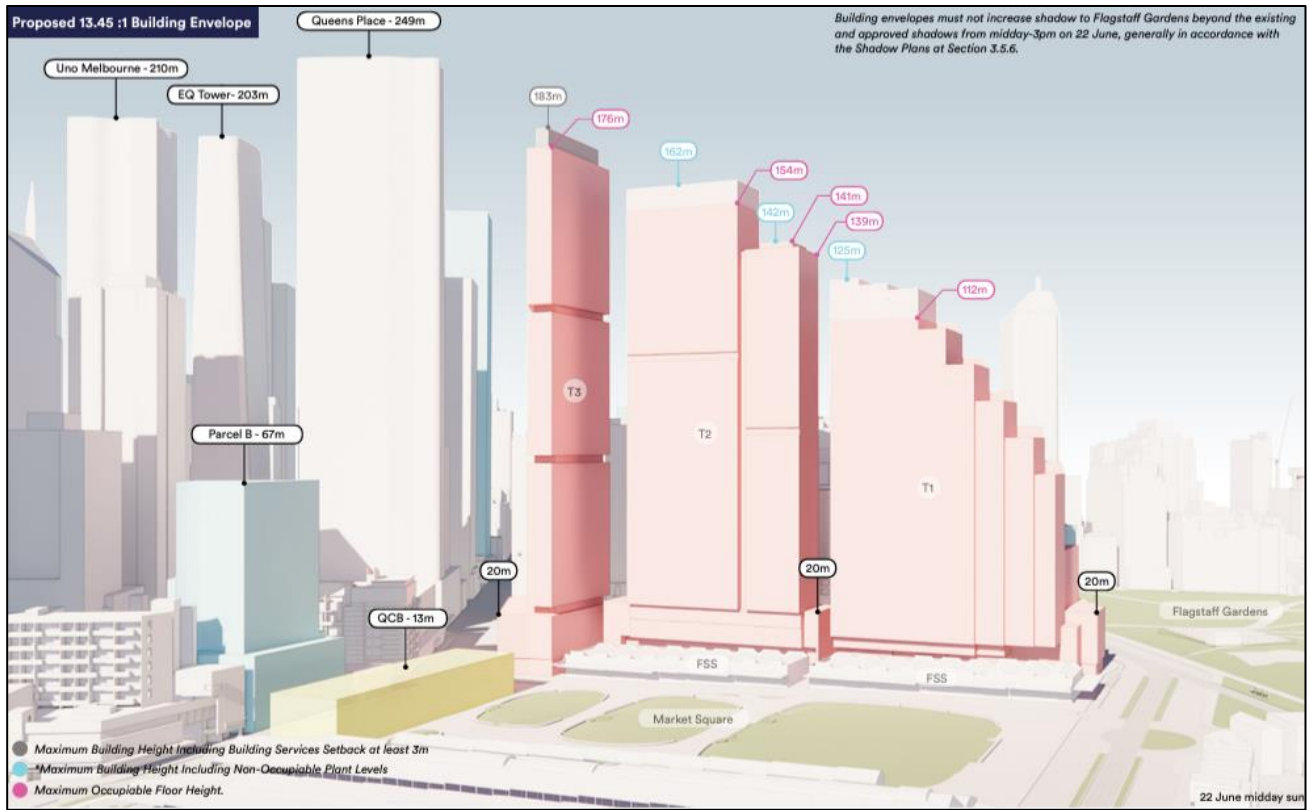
Proposed building envelopes in approved Development Plan (Source: DP Application)
